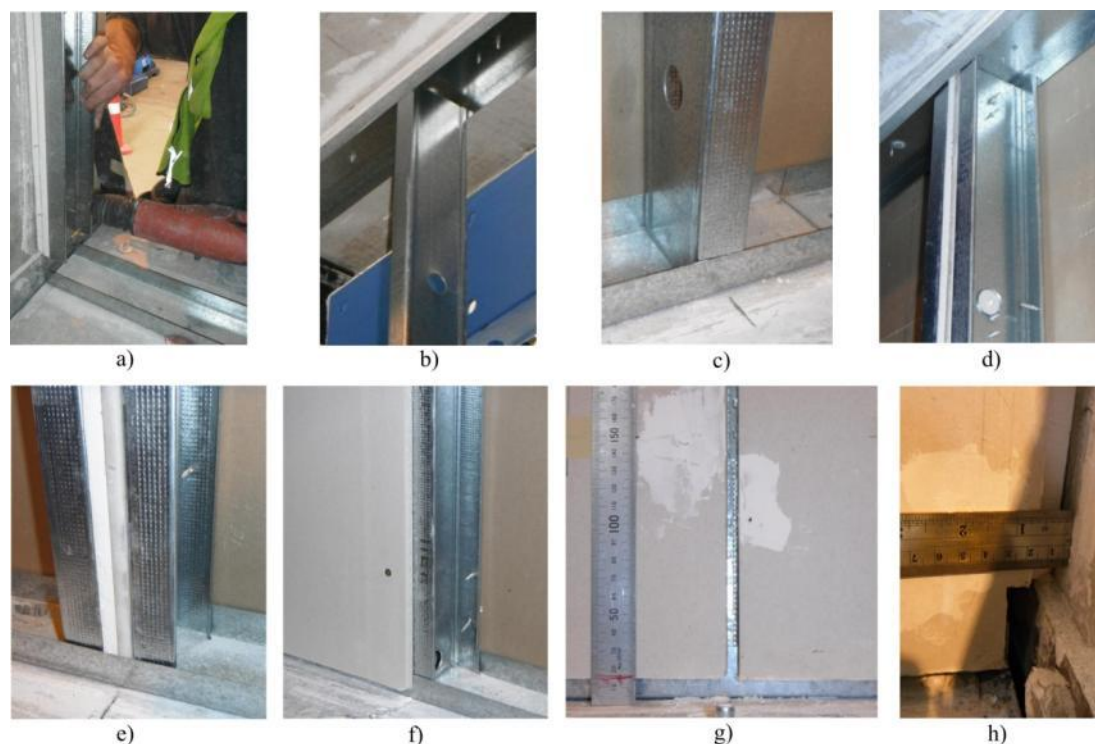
Construction sequence of low damage steel framed drywall specimen MIF1-STFD, for details refer to Figure 6.3
